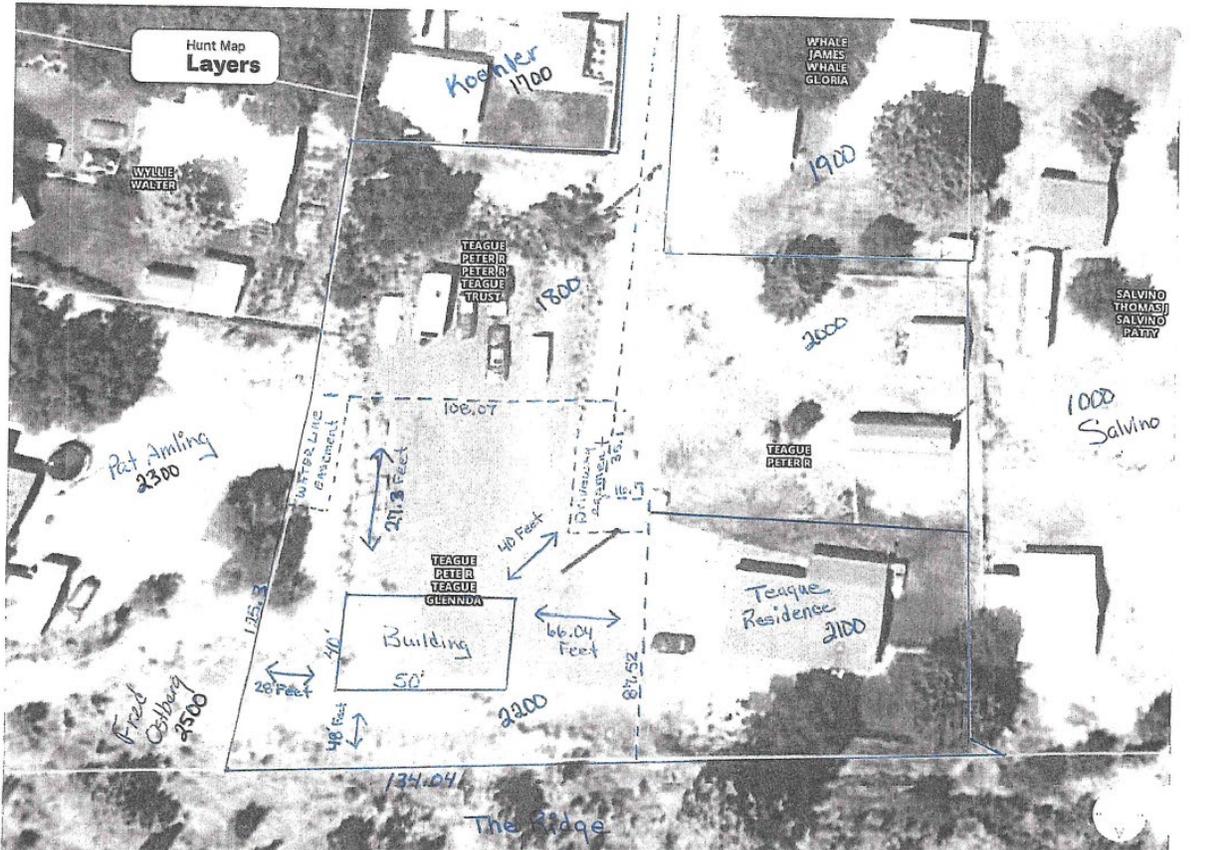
Applicant site plan. Accessory building located west of primary residence.
